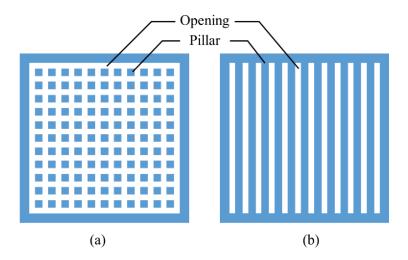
Mine panel layouts: (a) room and pillar with and without additional benching and (b) room and pillar with long pillar
